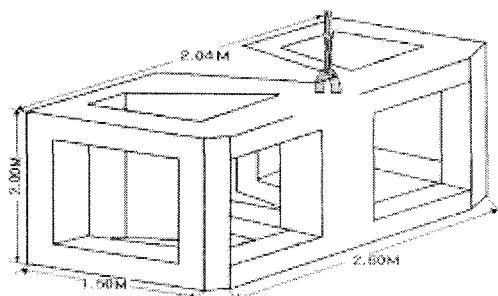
The schematic design of the artificial seaweed reefs made of concrete.
